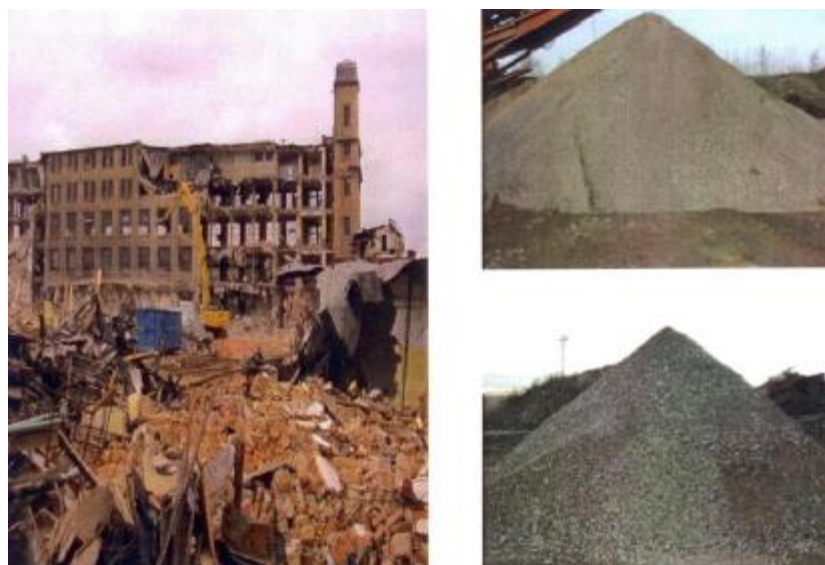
Demolished structure and obtained masonry building waste, grades 0/8 and 8/32.
